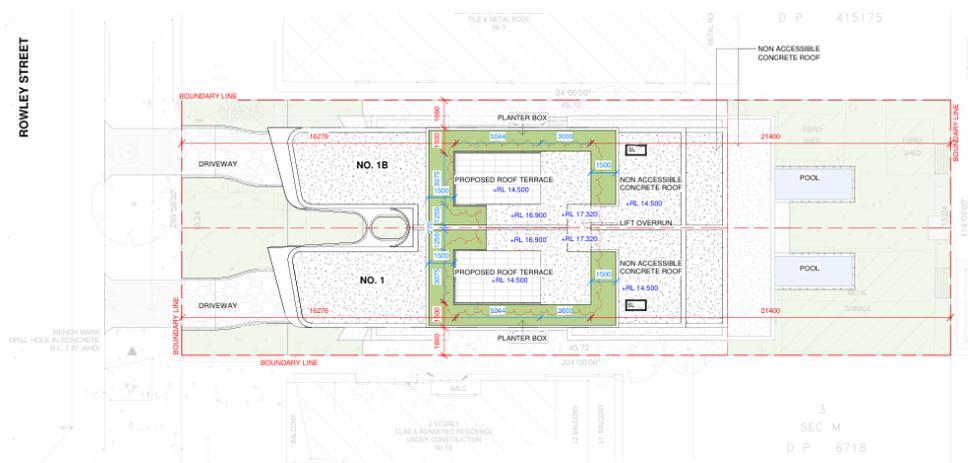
Proposed site plan with proposed roof top terrace centrally located (Source; Resolut, 2024).
